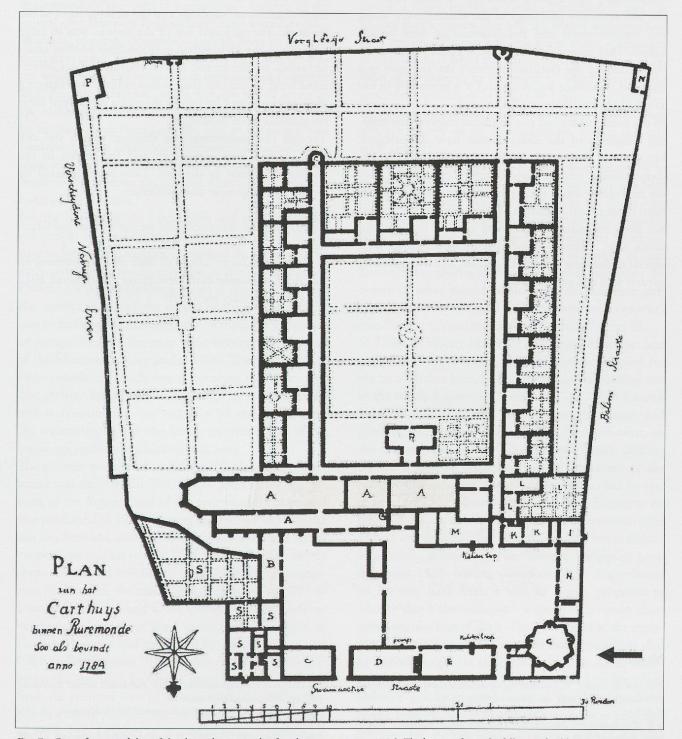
Copy of a groundplan of the charterhouse, made after the suppression in 1784. The letters refer to the following buildings: A church, chapterhouse and refectory - B coach house - C stables - D brewery and kitchen - E guesthouse - F sacristy - G Bethlehem chapel - H laybrothers' quarters - I parlour - K cell of the procurator - L cell of the prior - M monks' kitchen - N orangerie - P barn Gemeentearchief Roermond.
